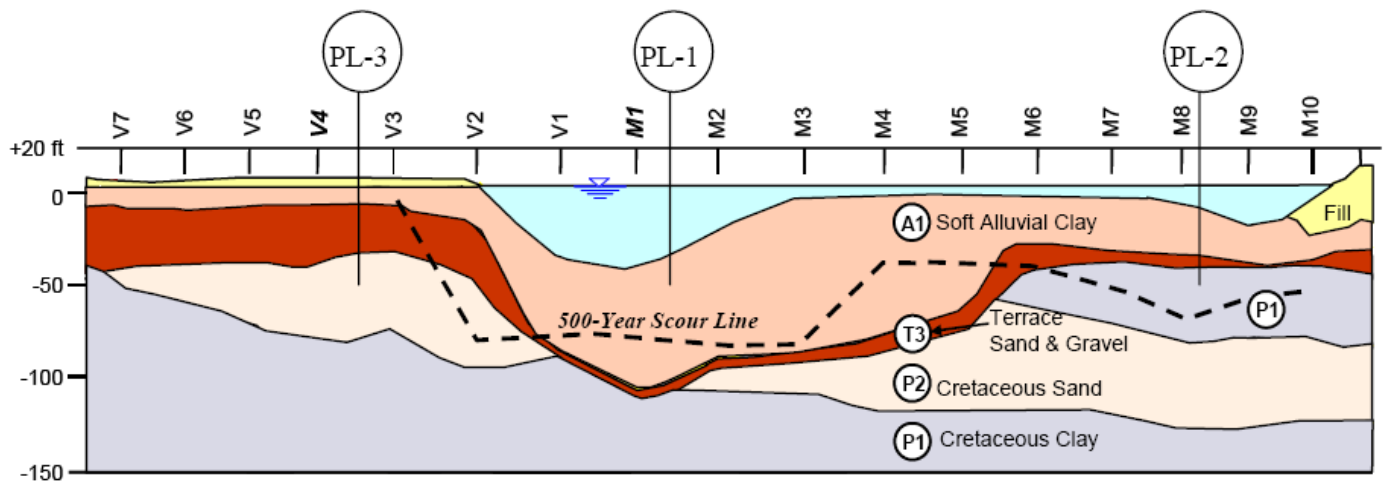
, Paper 8.07.a: Soil and estimated scour profile, bridge pier locations, and pile load test locations.
